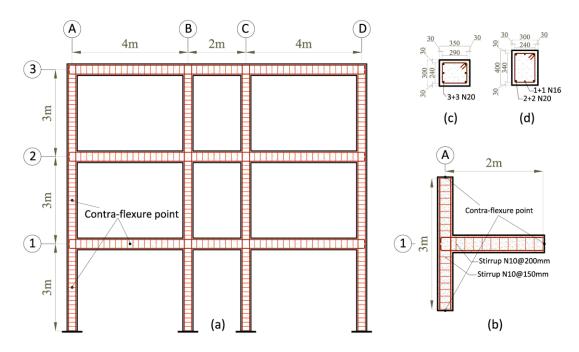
Geometry of case study model: (a) Full-scale RC moment resisting frame; (b) Exterior Beam-Column Joint; (c) Column section; (d) Beam section.
